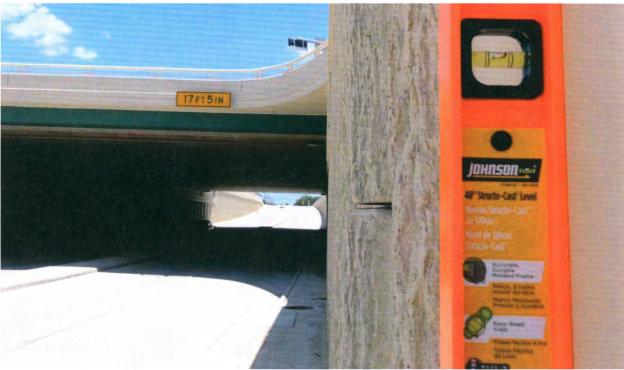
Wall facing was observed to be vertical and in good condition throughout the project area.
